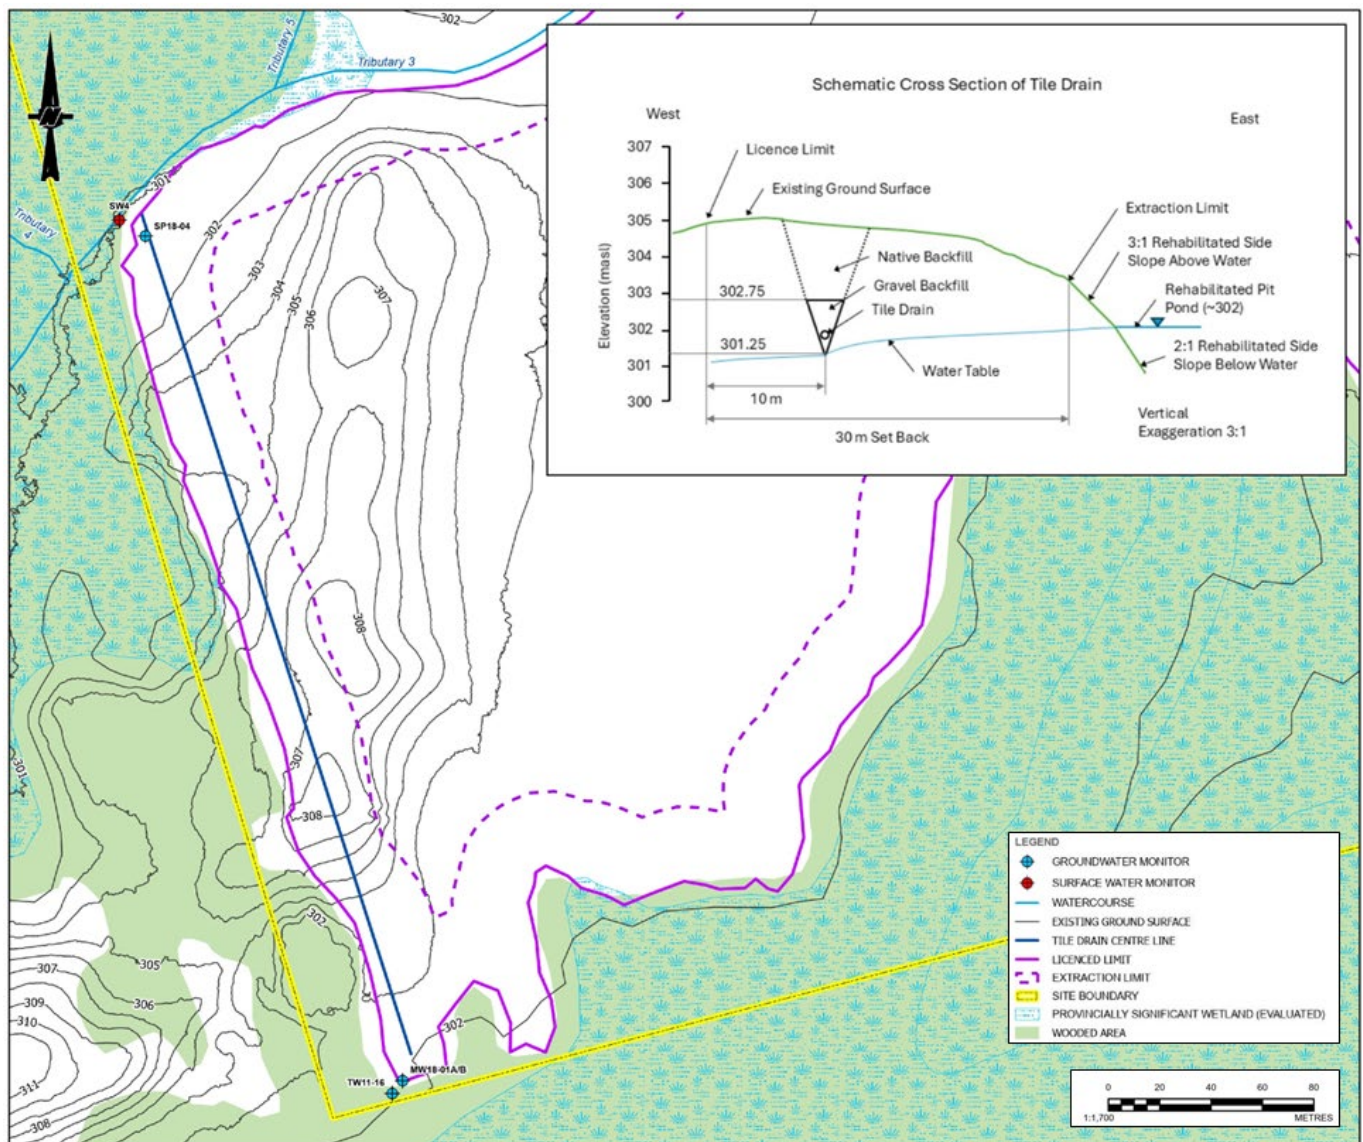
Proposed Tile Drain Alignment and Cross Section Detail
